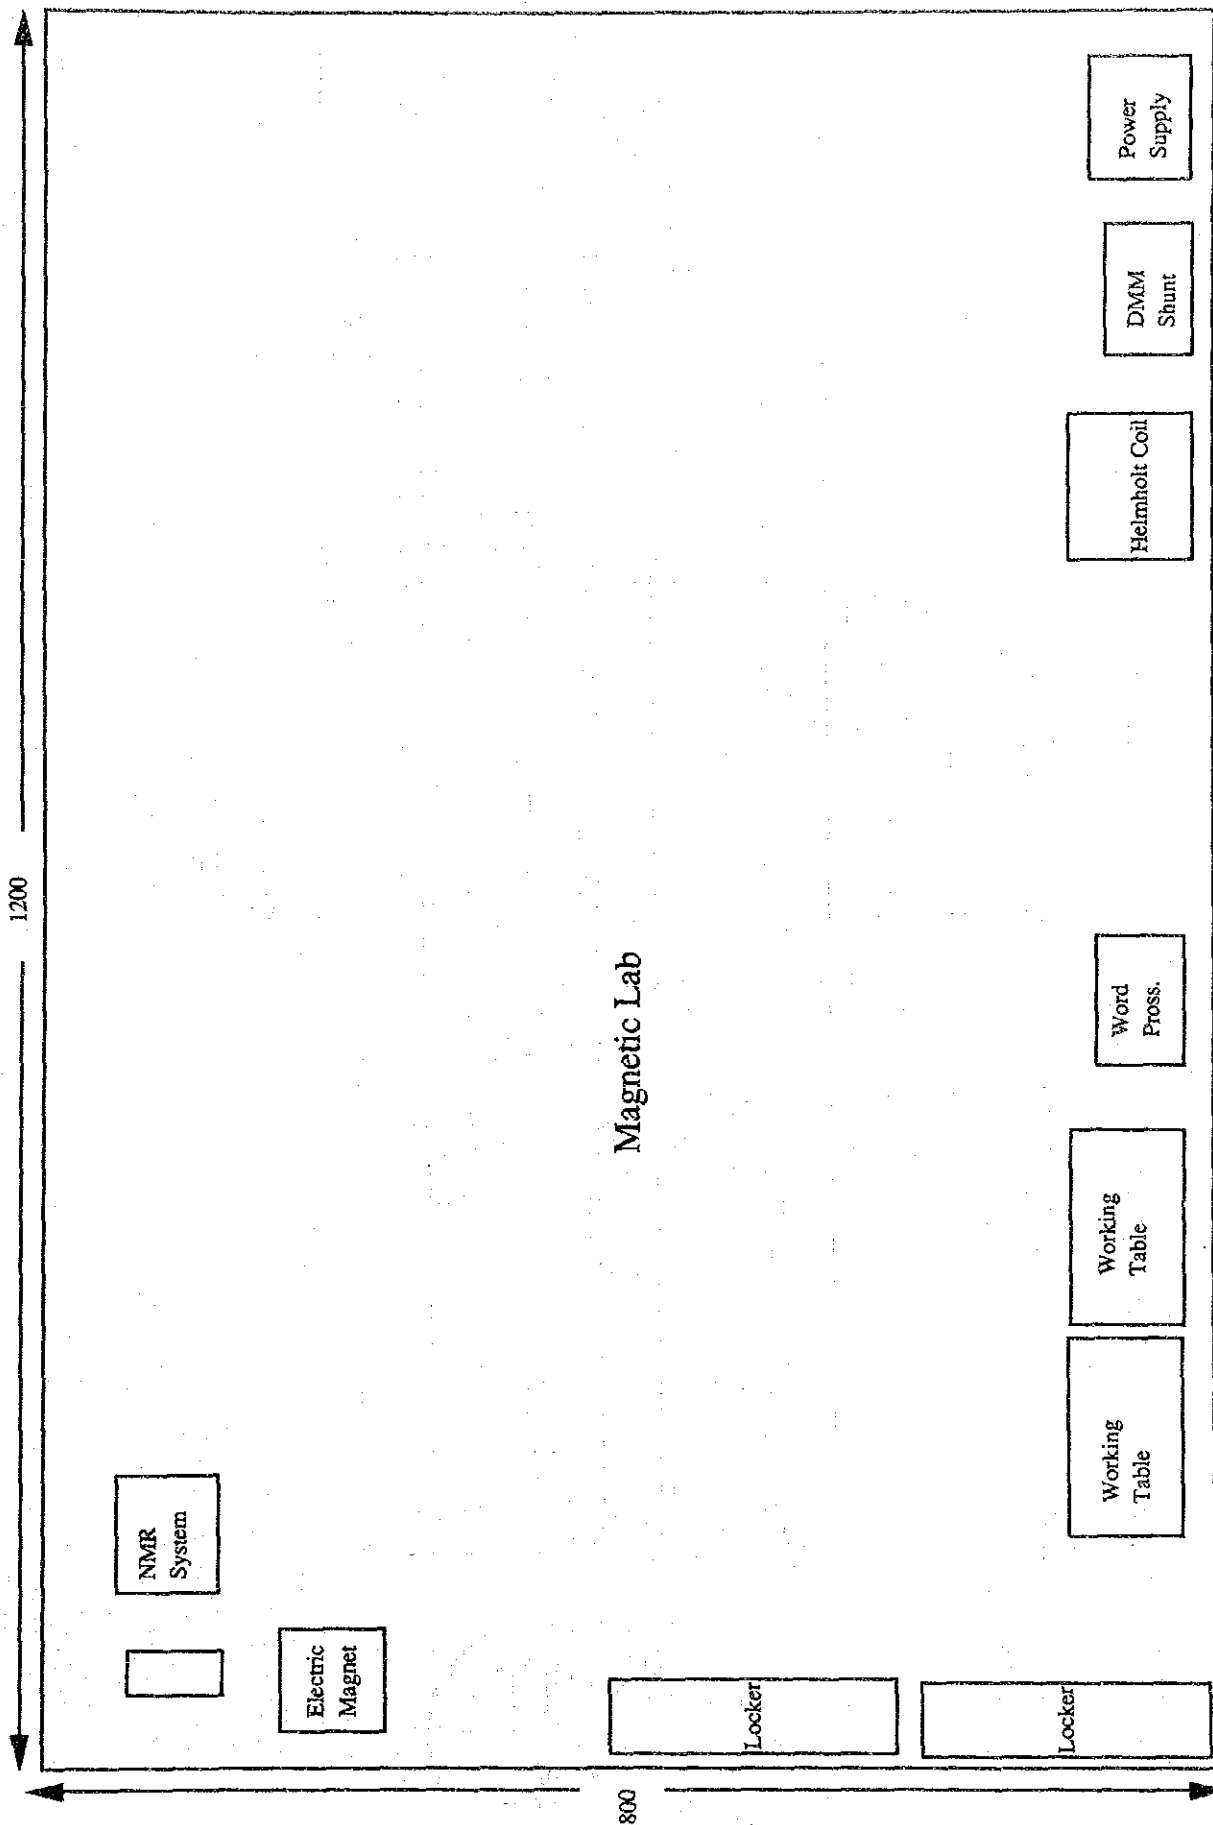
Layout Plan of Electrical Standards Laboratory (Magnetic)
